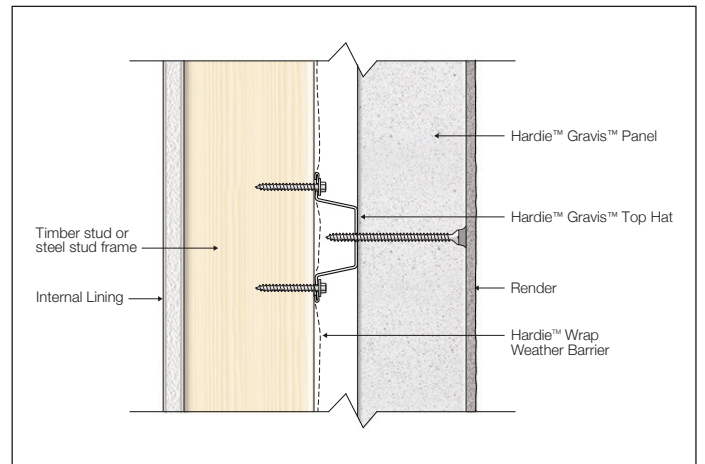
ZERO LOT WALL EXTERNALLY FIXED DETAIL
